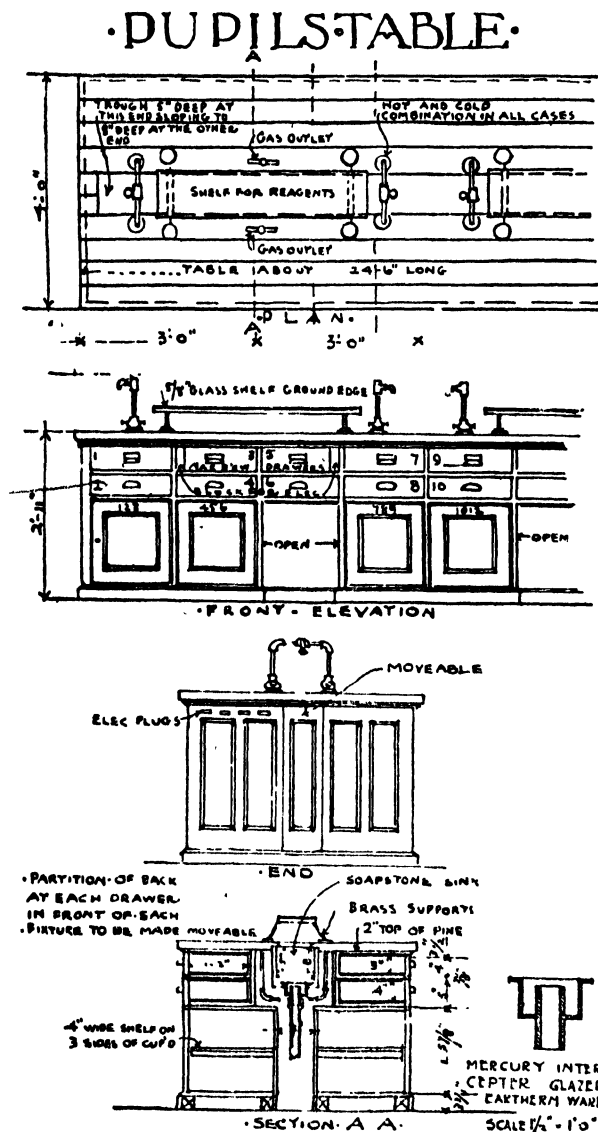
Standard Chemical Bench adopted by the School House Department, Boston, U.S.A.
